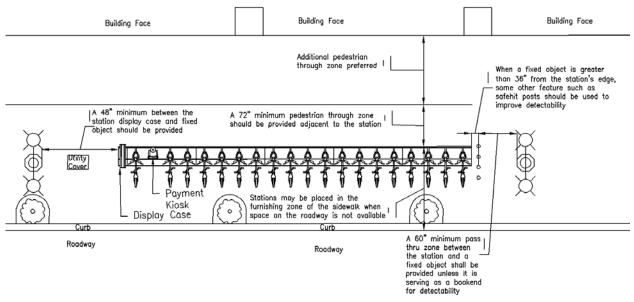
Typical placement of sidewalk bicycle sharing station in the furniture zone with bicycles being withdrawn towards the roadway. This orientation is preferred as it reduces the potential for conflicts in the pedestrian through zone.
